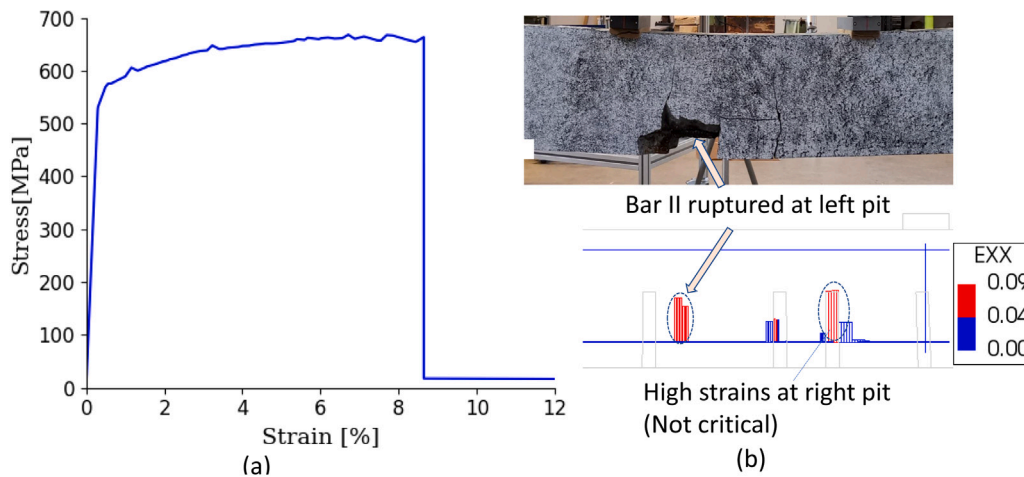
Stress versus strain for tensile bar II at the critical pit of DN1 beam from FE analyses: (a) Stress versus strain at left pit, indicating failure of the beam, (b) Reinforcement element with high strain which initiated failure of the beam due to rupture. The experimental photo shows failure due to rupture of corroded tensile rebar.
